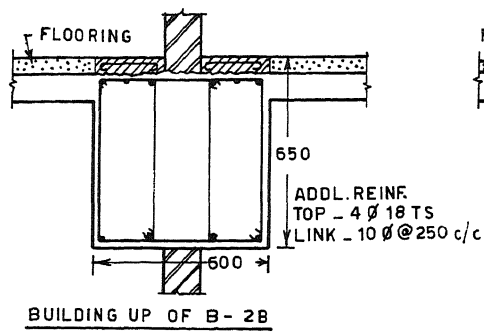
BUILDING UP OF BEAM / COLUMN FROM ONE SIDE - CASE IV
